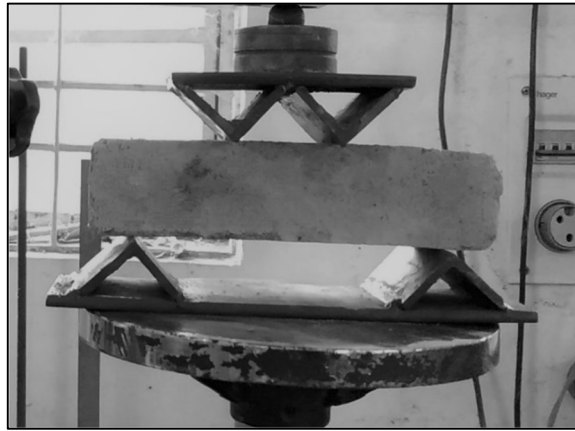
Flexural strength testing of stabilized soil specimens
